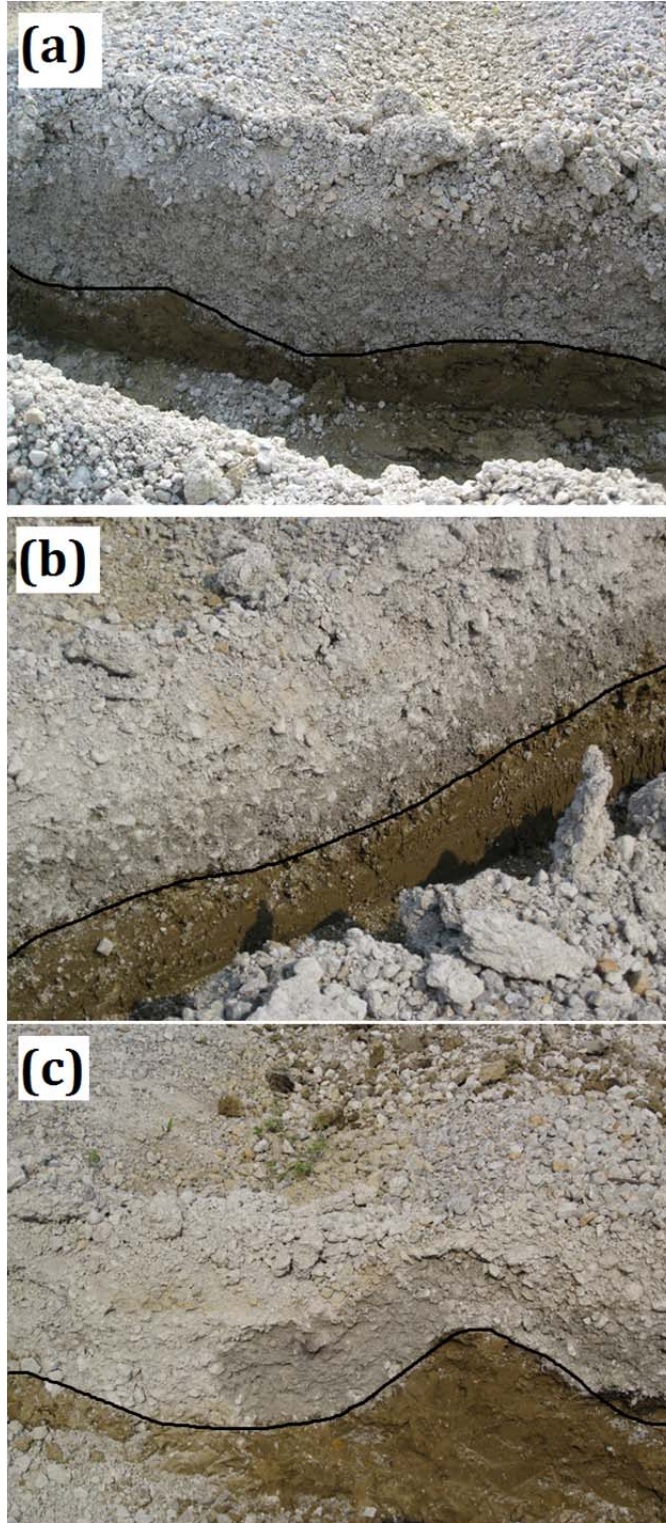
Excavated trench photos showing surface and base-subgrade interface deformations in test sections (a) 1, (b) 2, and (c) 3 for Cell 4 due to loading under flooded conditions
